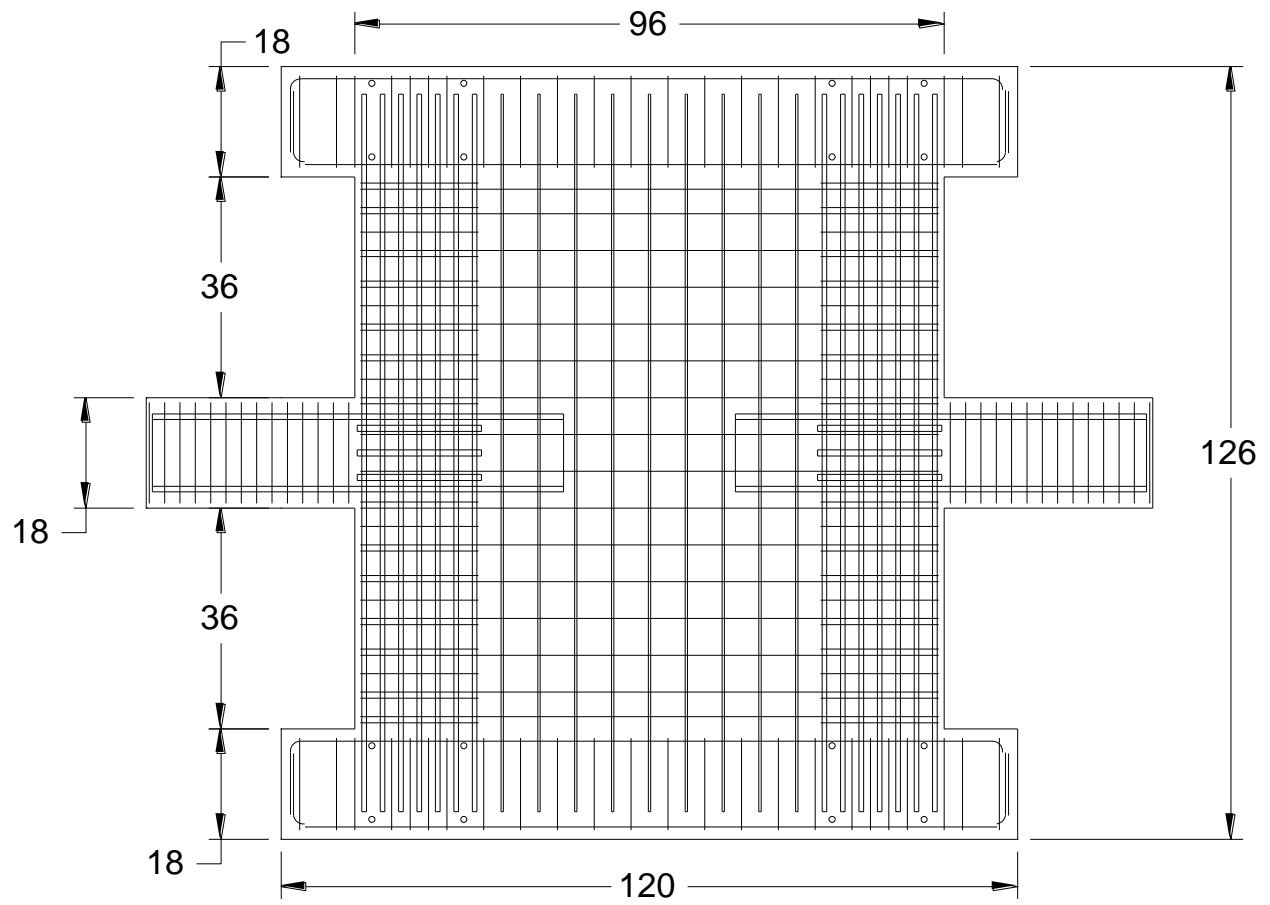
Elevation View of Test Specimen with SRC-W1 and SRC-W2
